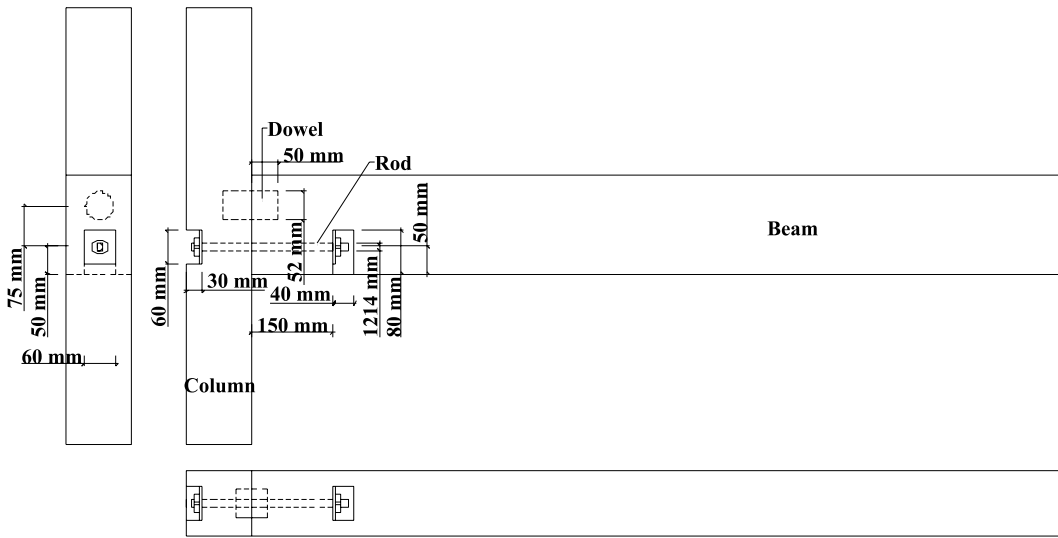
Beam and column joint configuration with 1 threaded rod at the bottom location.
